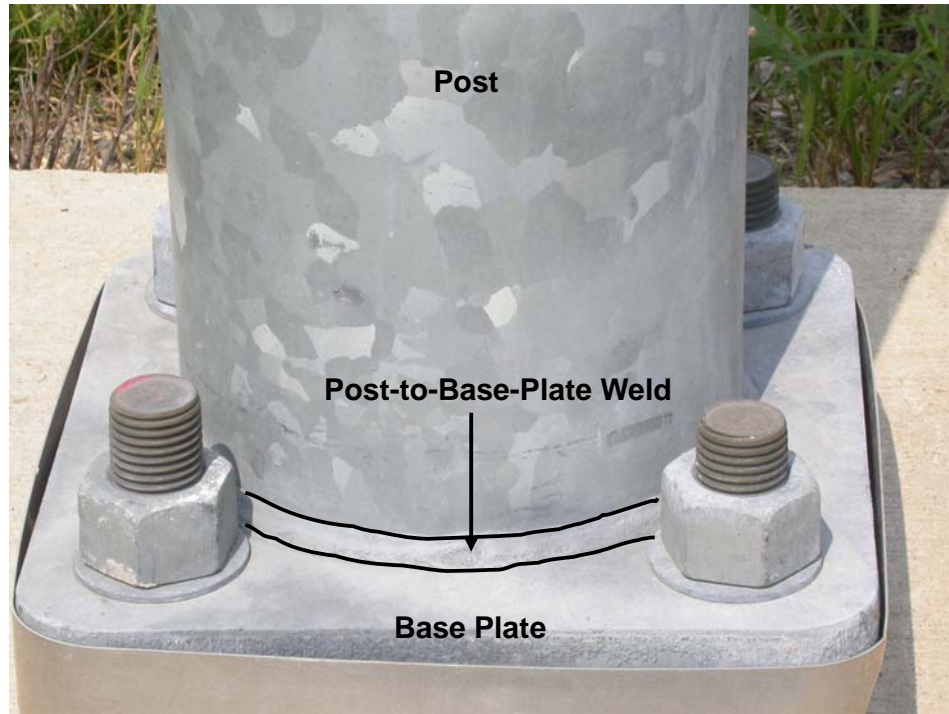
Post-to-base-plate weld detail of a monotube sign structure.
